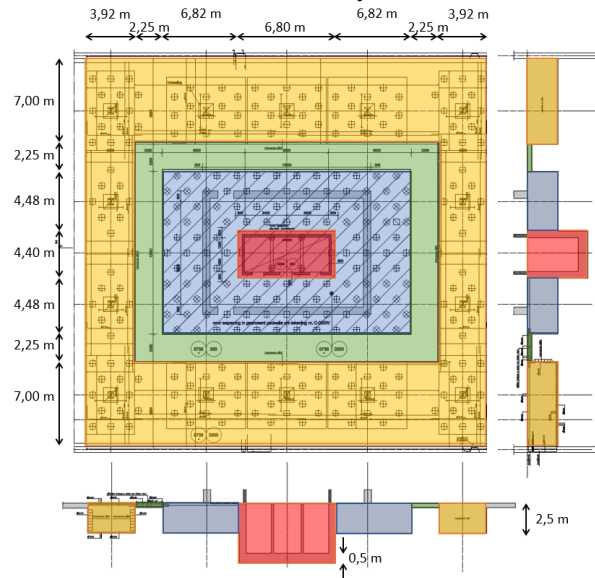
Pile plan and foundation slab drawing showing the location of the piles and the varying thicknesses of the slab.
